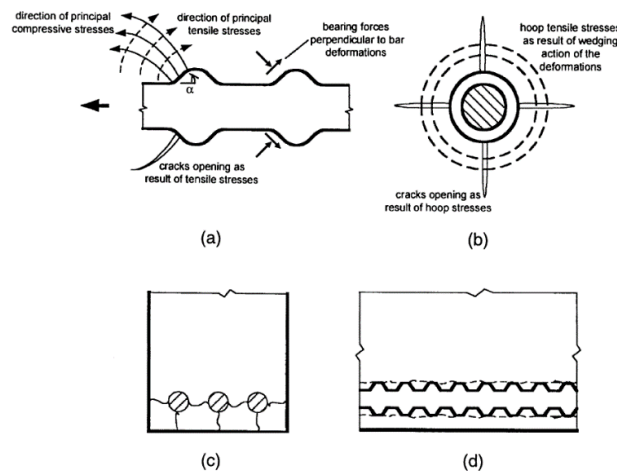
Damage mechanism in bond loss due to pull-out force a) cracks formation b) splitting cracks formations parallel to the bar c) splitting cracks between end bar and concrete cover, d) local concrete crushing (reproduced from ACI 408 2003)
